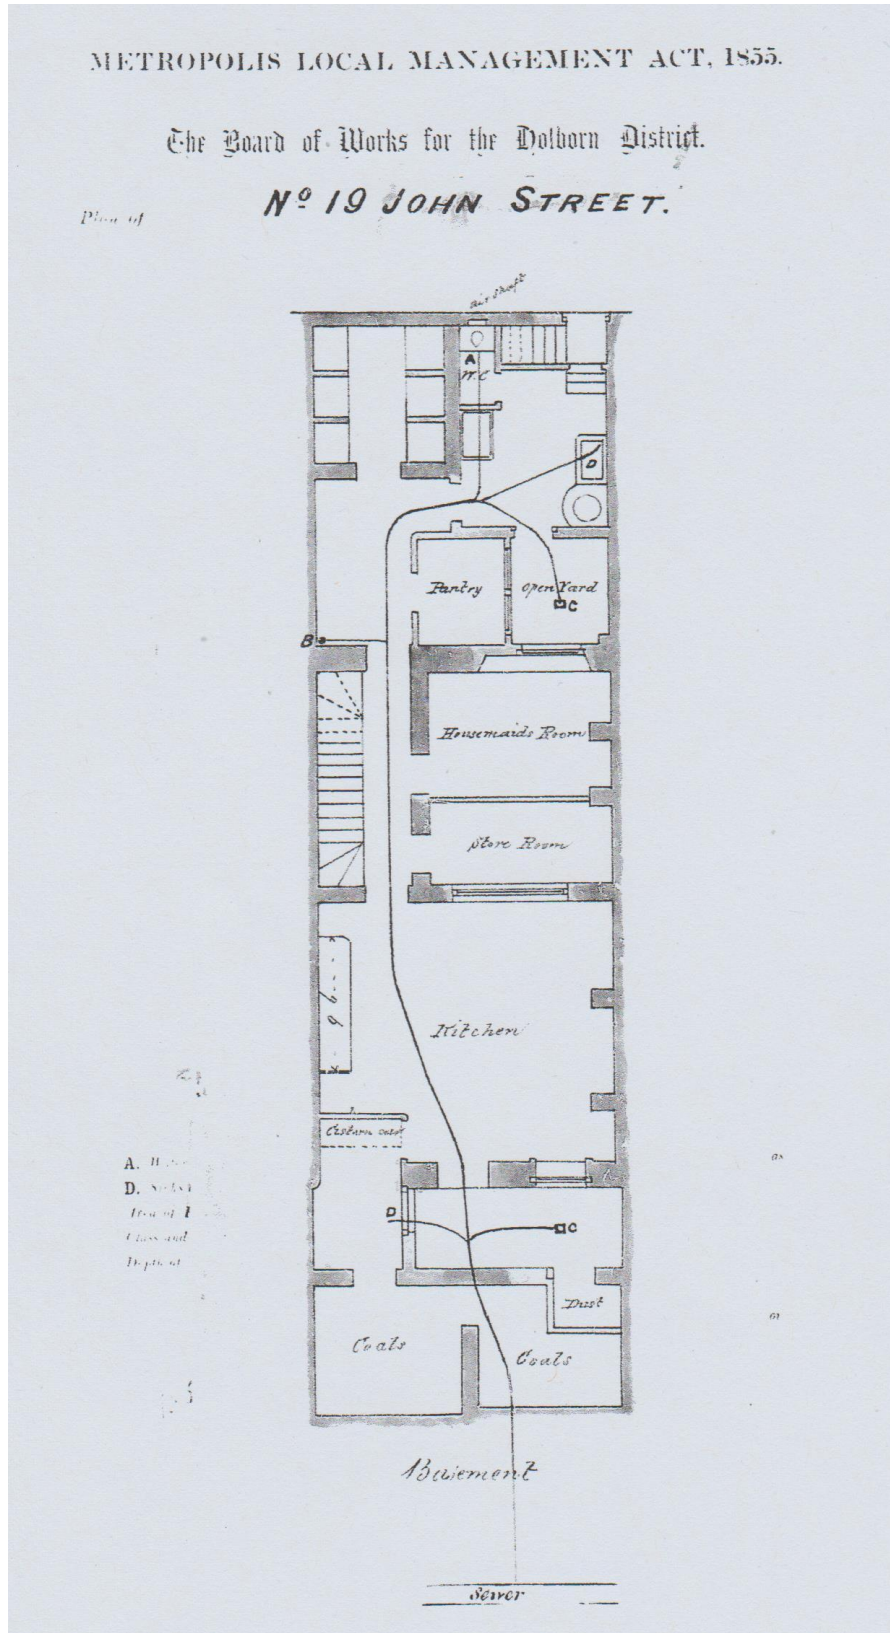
The basement plan in 1911 (Camden archives drainage plans)
